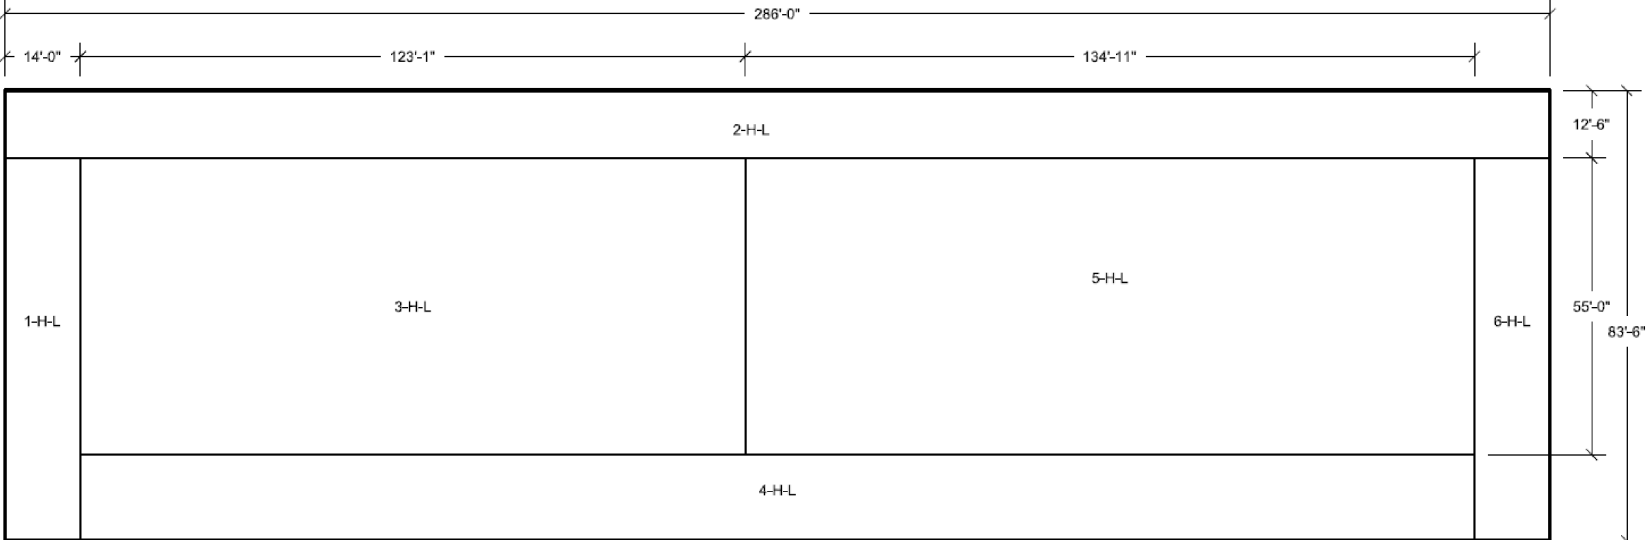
H.6-84 UHS Basin North Wall Looking South Horizontal Reinforcement Zones Far Side Face
